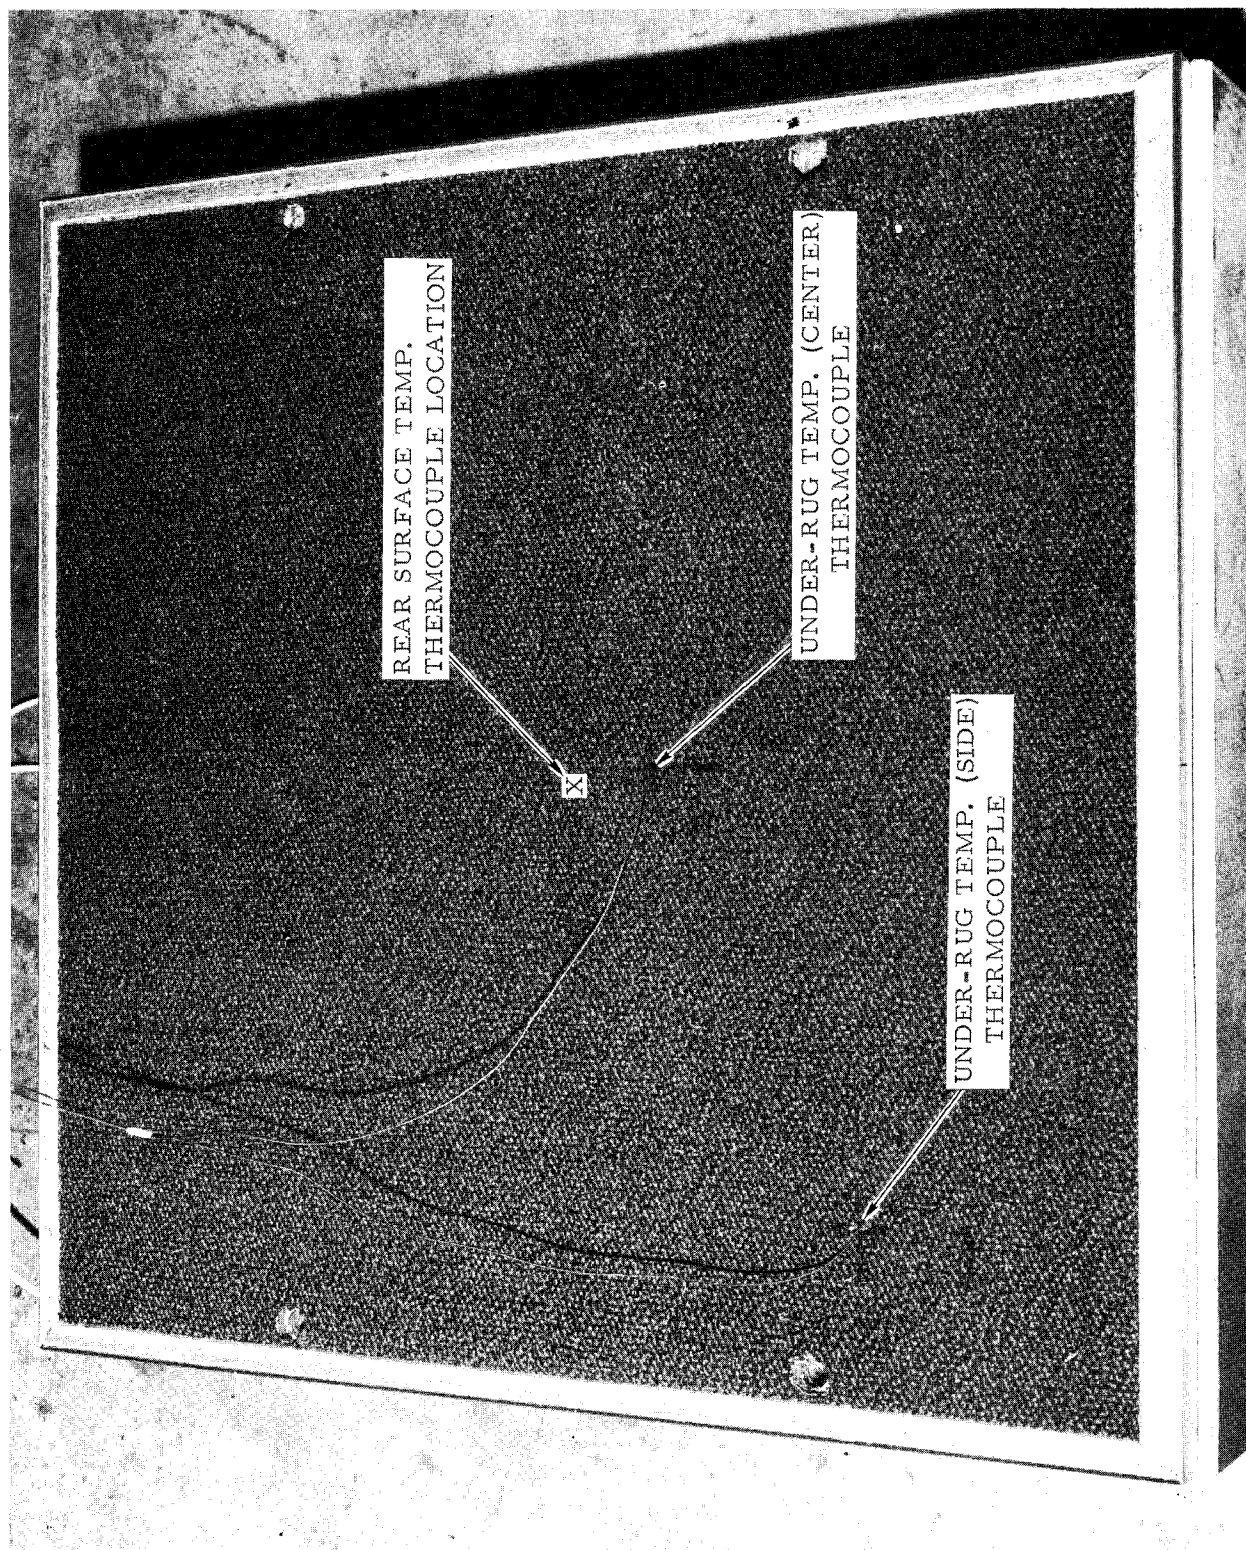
PANEL NO. 2A - FLOOR SECTION - NYLON
